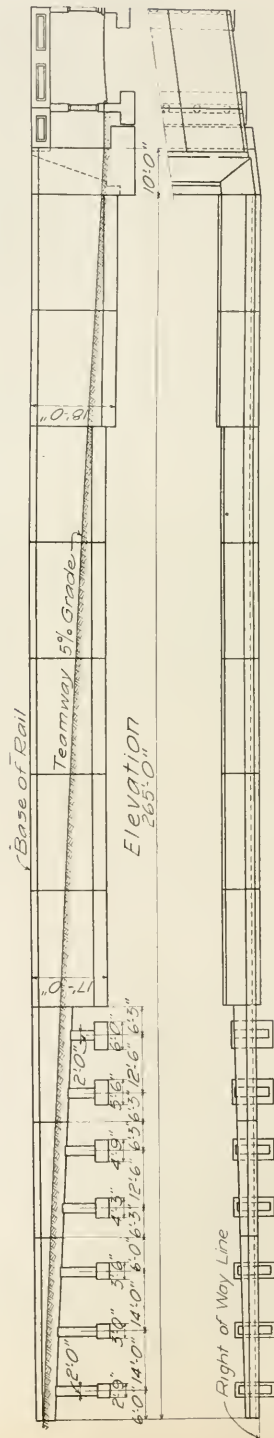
PLAN AND ELEVATION OF A TEAMWAY WALL.
